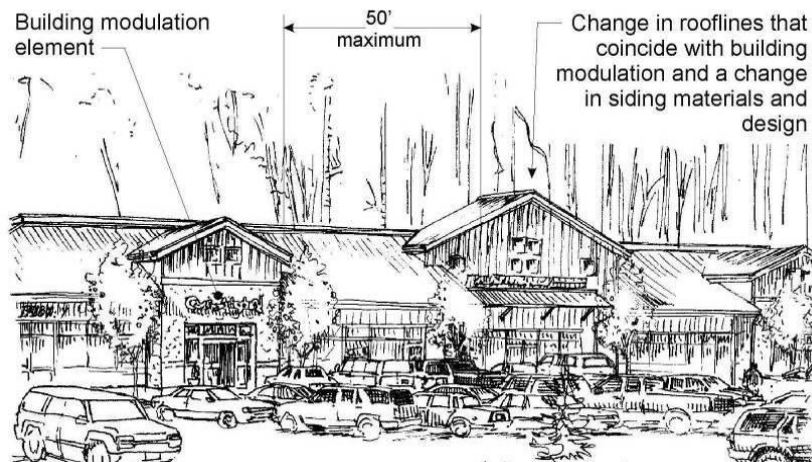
An example of building articulation (note how the building breaks up the large facade by a combination of roofline changes, entry and window patterns, landscaping, awnings, and other
